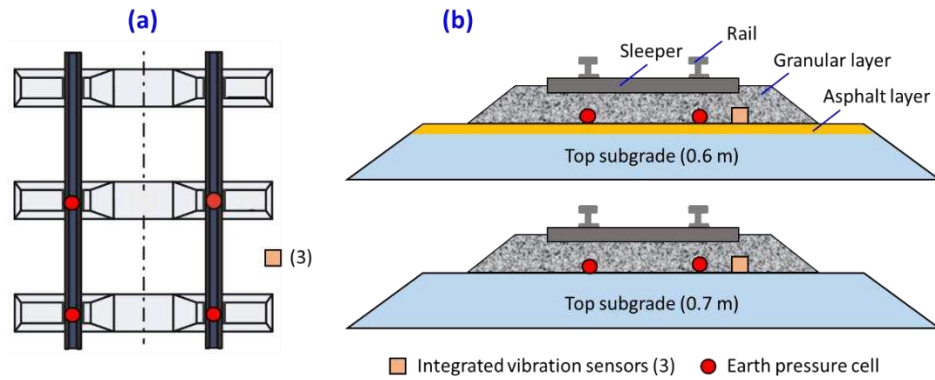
Instrumentation layout at the test site: (a) plan view; (b) cross-section.
